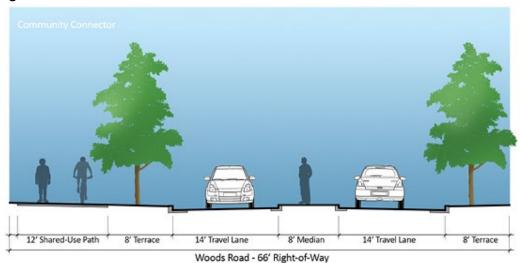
Woods Road 66' Cross-section with Pedestrian Median
